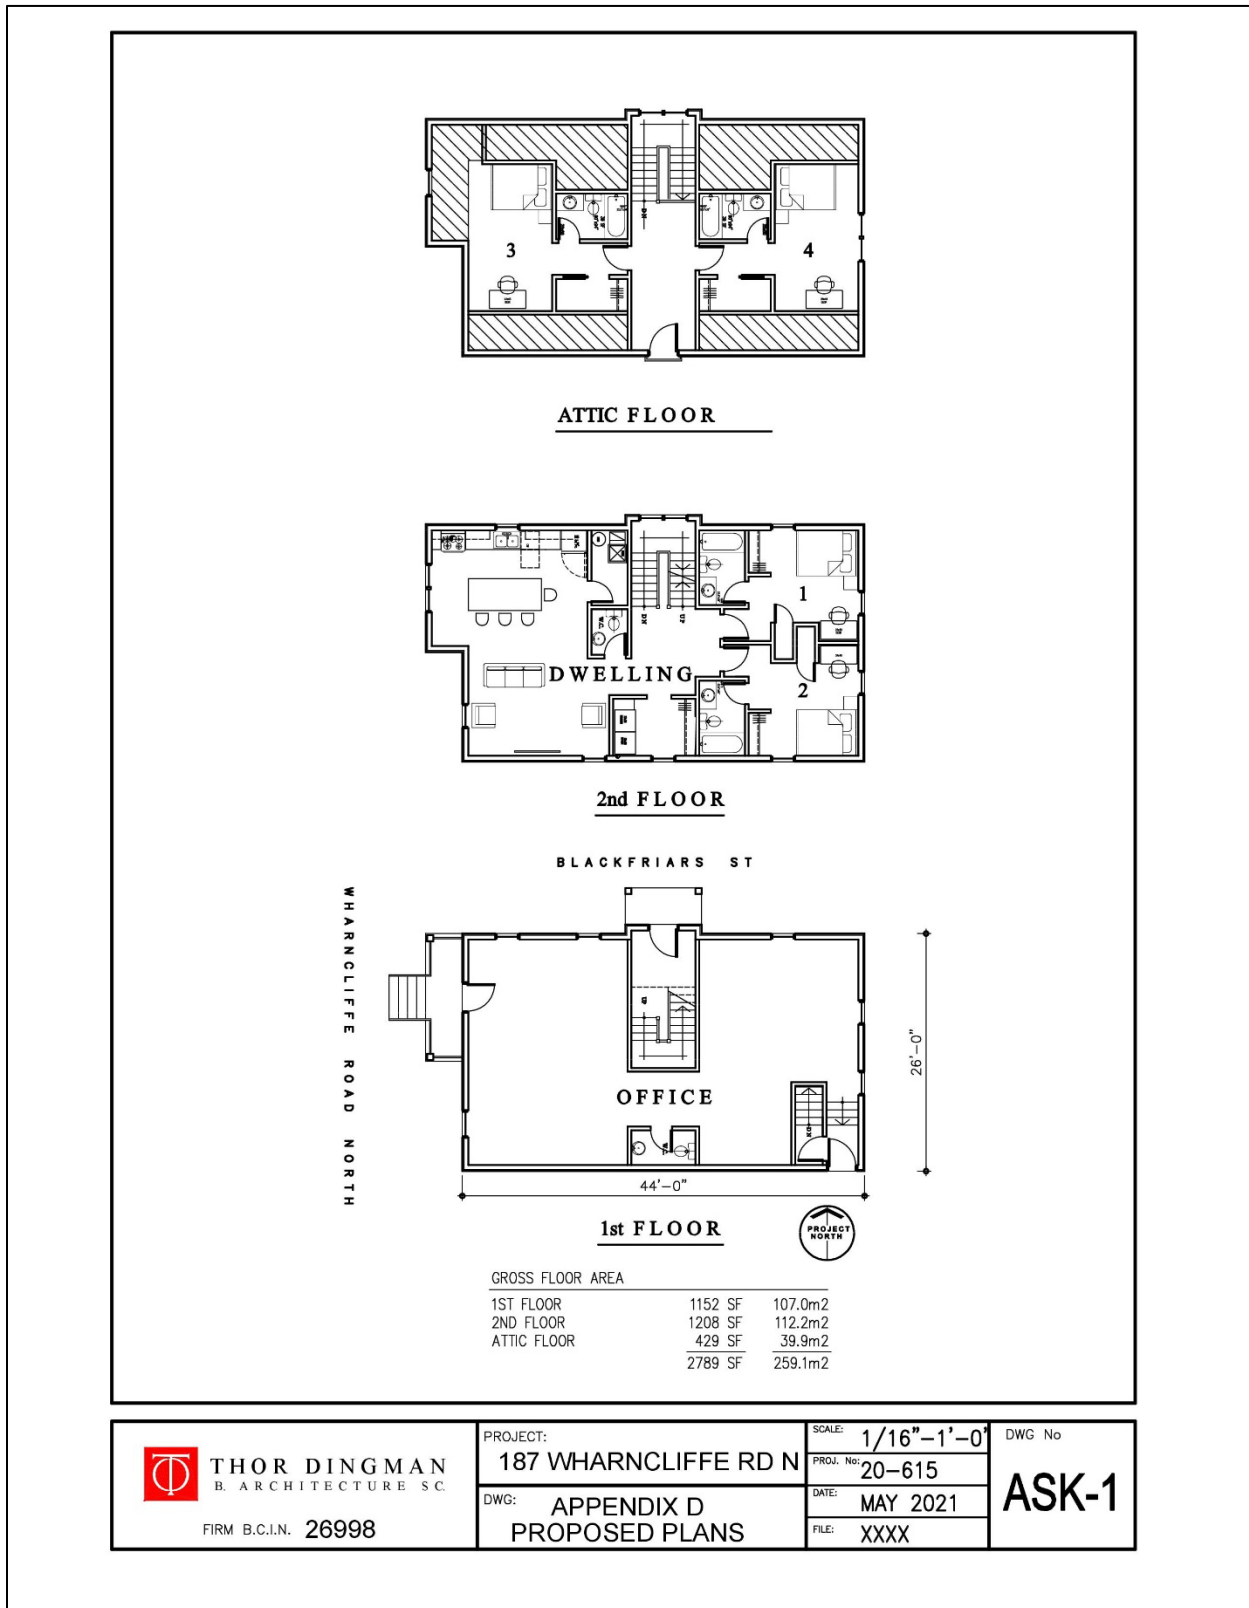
Floor plans of the proposed building at 187 Wharncliffe Road North (TD-BAS Inc., dated May 2021).
